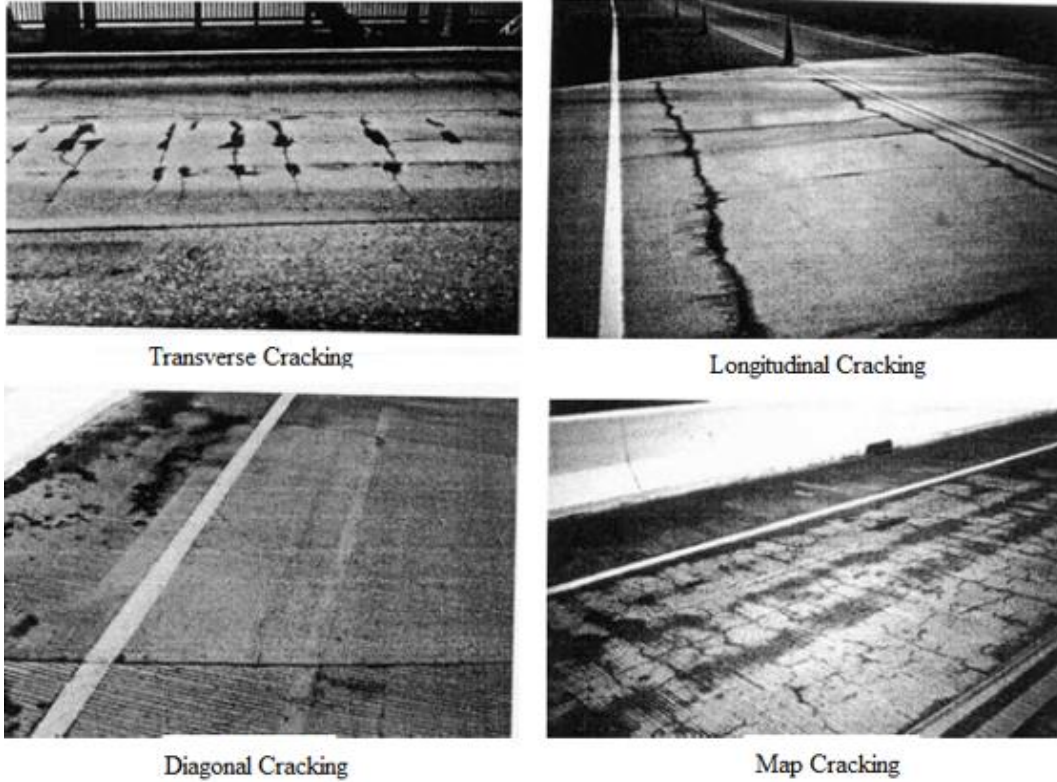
Types of Concrete Bridge Deck Cracking Based on Orientation (Russell, 2004)
